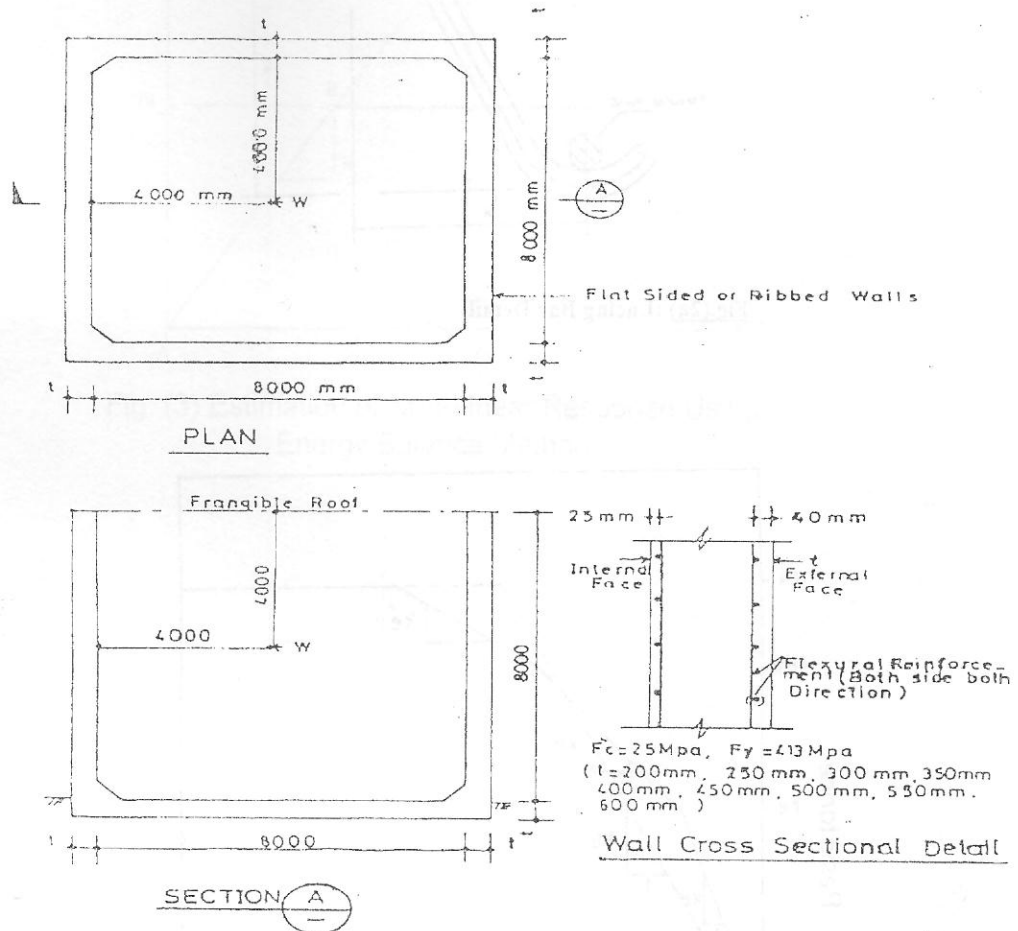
Plan, Section and Cross Sectional Detail for the Cubical Barrier Used in the Present Study.
